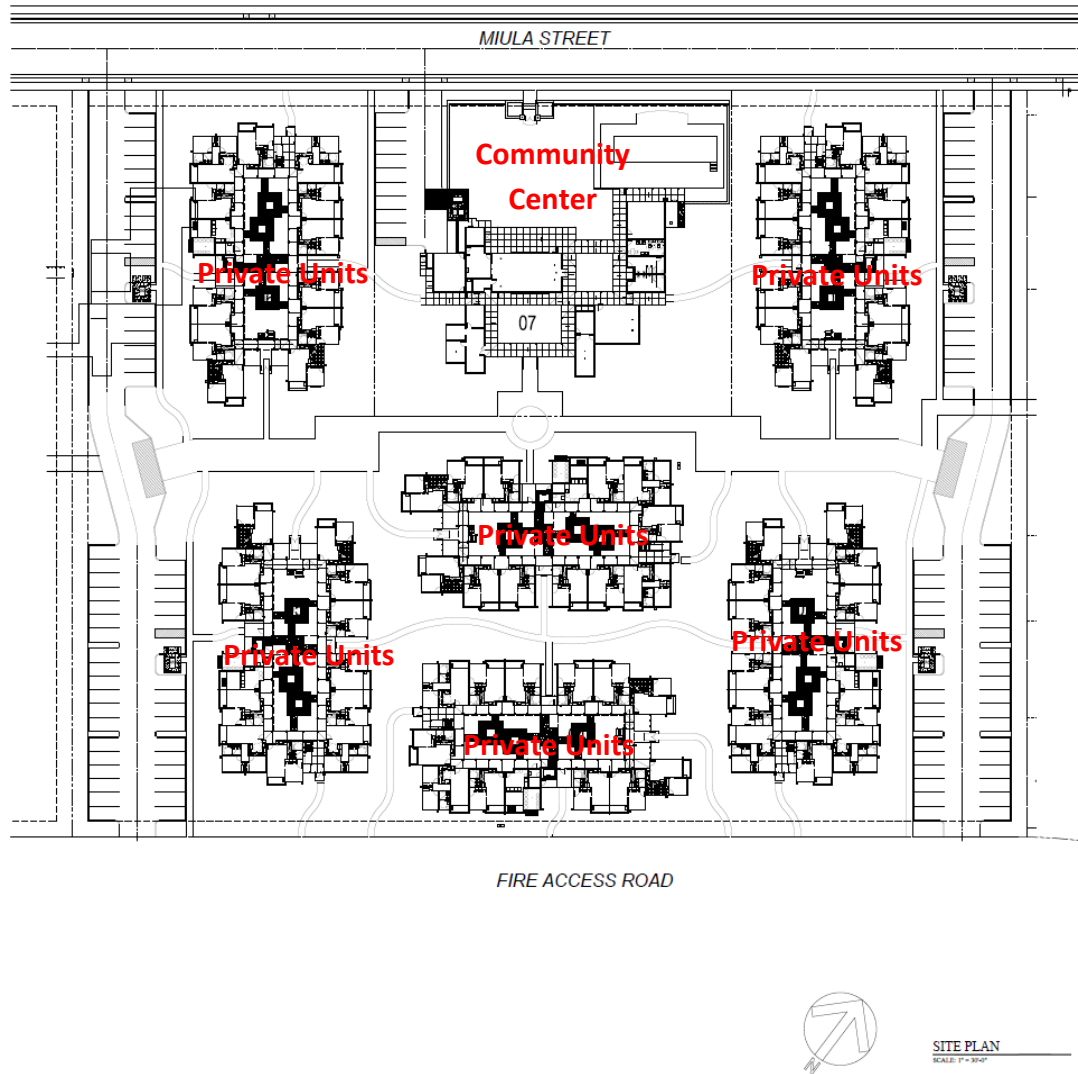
Franciscan Vistas Ewa Site Plan¹⁰²
